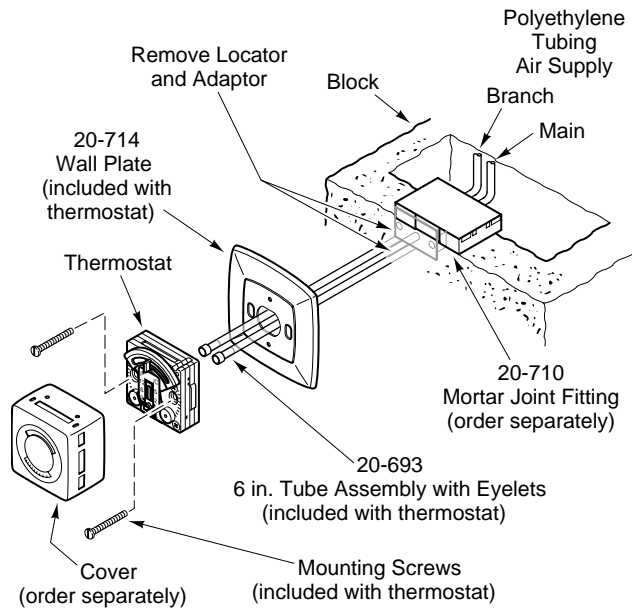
Thermostat Installation Using Pipehead in Masonry Wall.
